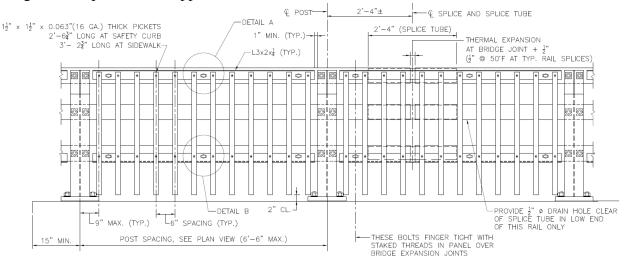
Elevation drawing for S3-TL4 bridge rail.
